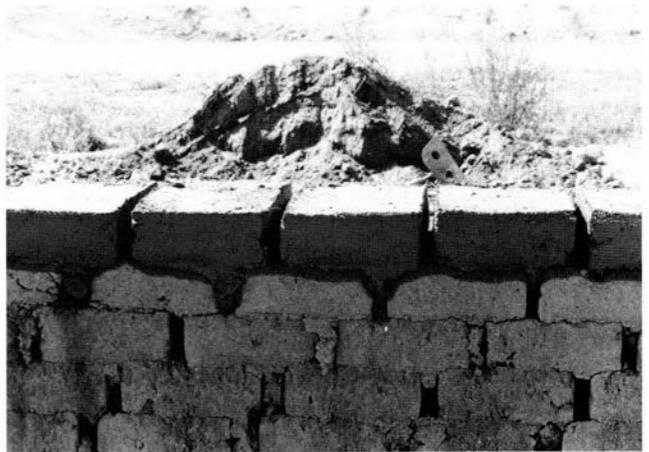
Close-up of adobe bricks after removal of five-mold wooden form. Note interlocking of bricks and lack of mortar (unlike normal sun-dried adobe-brick construction). Adobe Corrals Project, Corrections Industries, Santa Fe.
